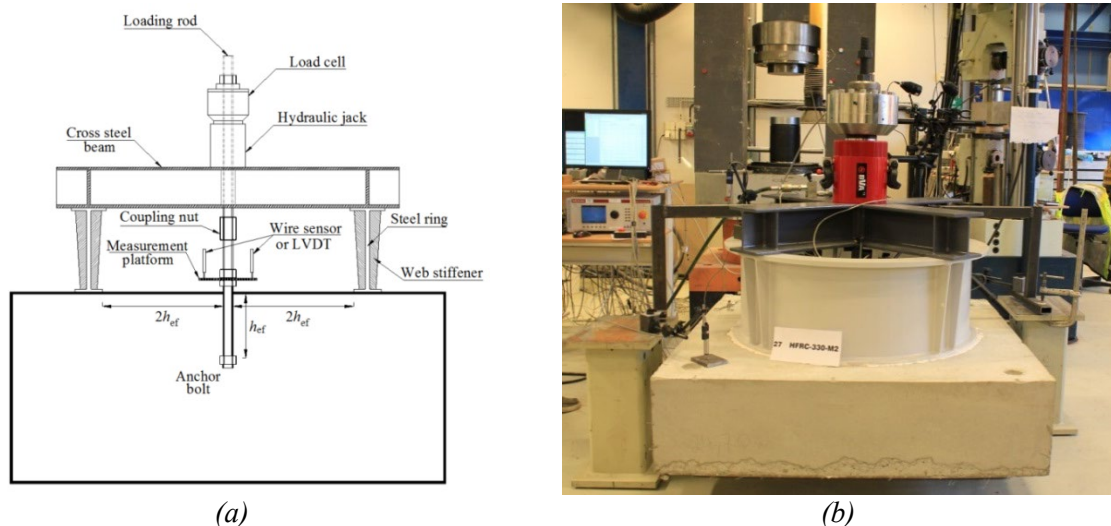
(a) Schematic view of the test setup, and (b) loading arrangement
